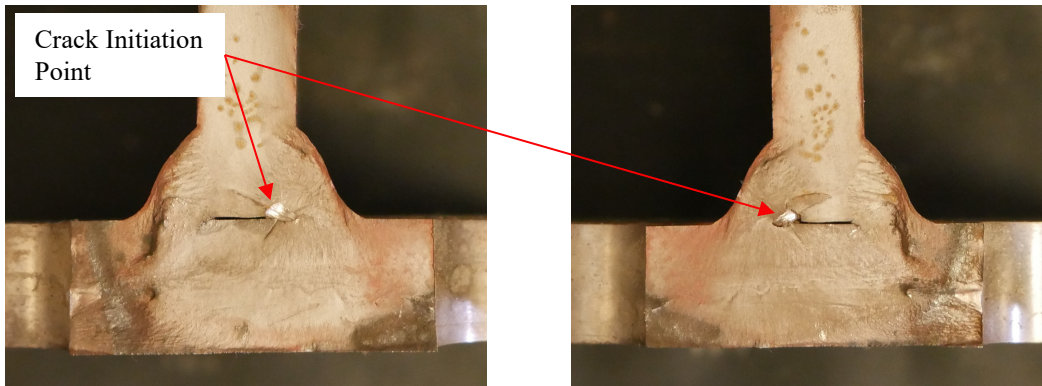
Illustration. Overview showing the different fatigue cracks for Girder 4 – Flange 1.
